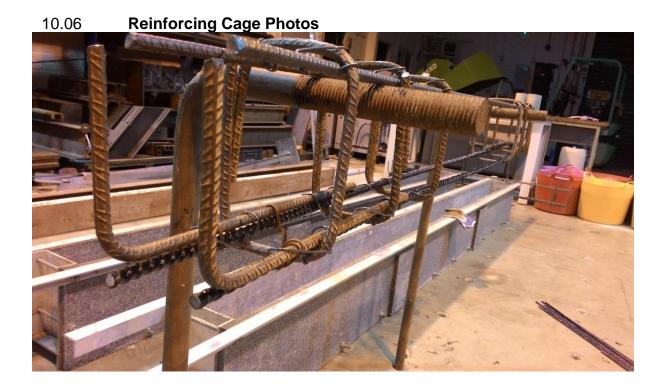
BFRP and Steel Reinforcement Setup in Beams B2 and B4.
